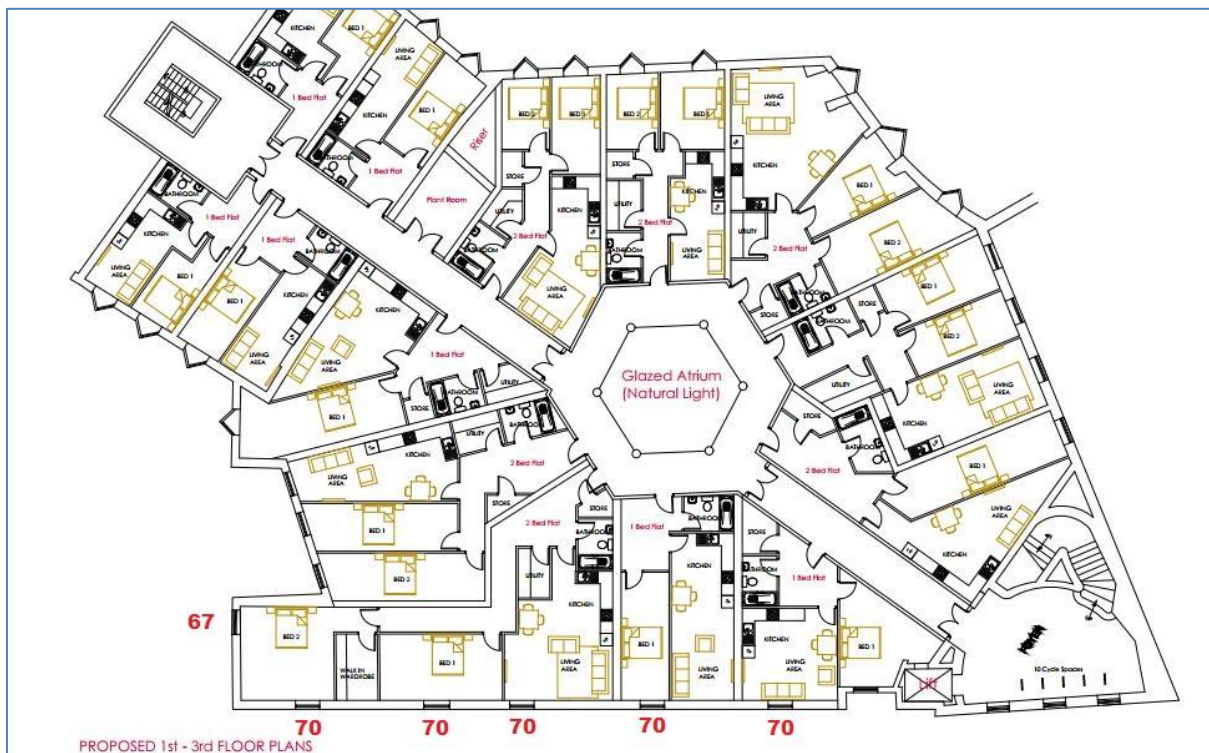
Proposed Development – Expected Façade Noise Levels – 2<sup>nd</sup> Floor
